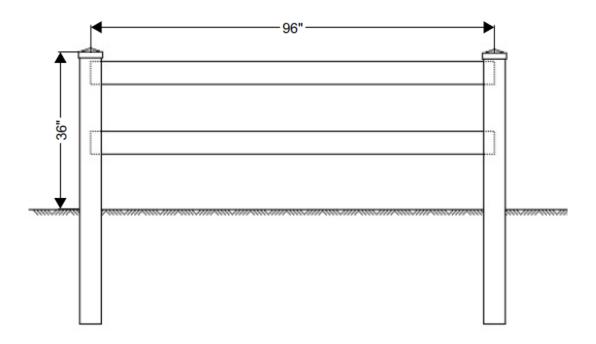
EXHIBIT D PAVILION AND PLAYGROUND DETAILS/EXAMPLE
